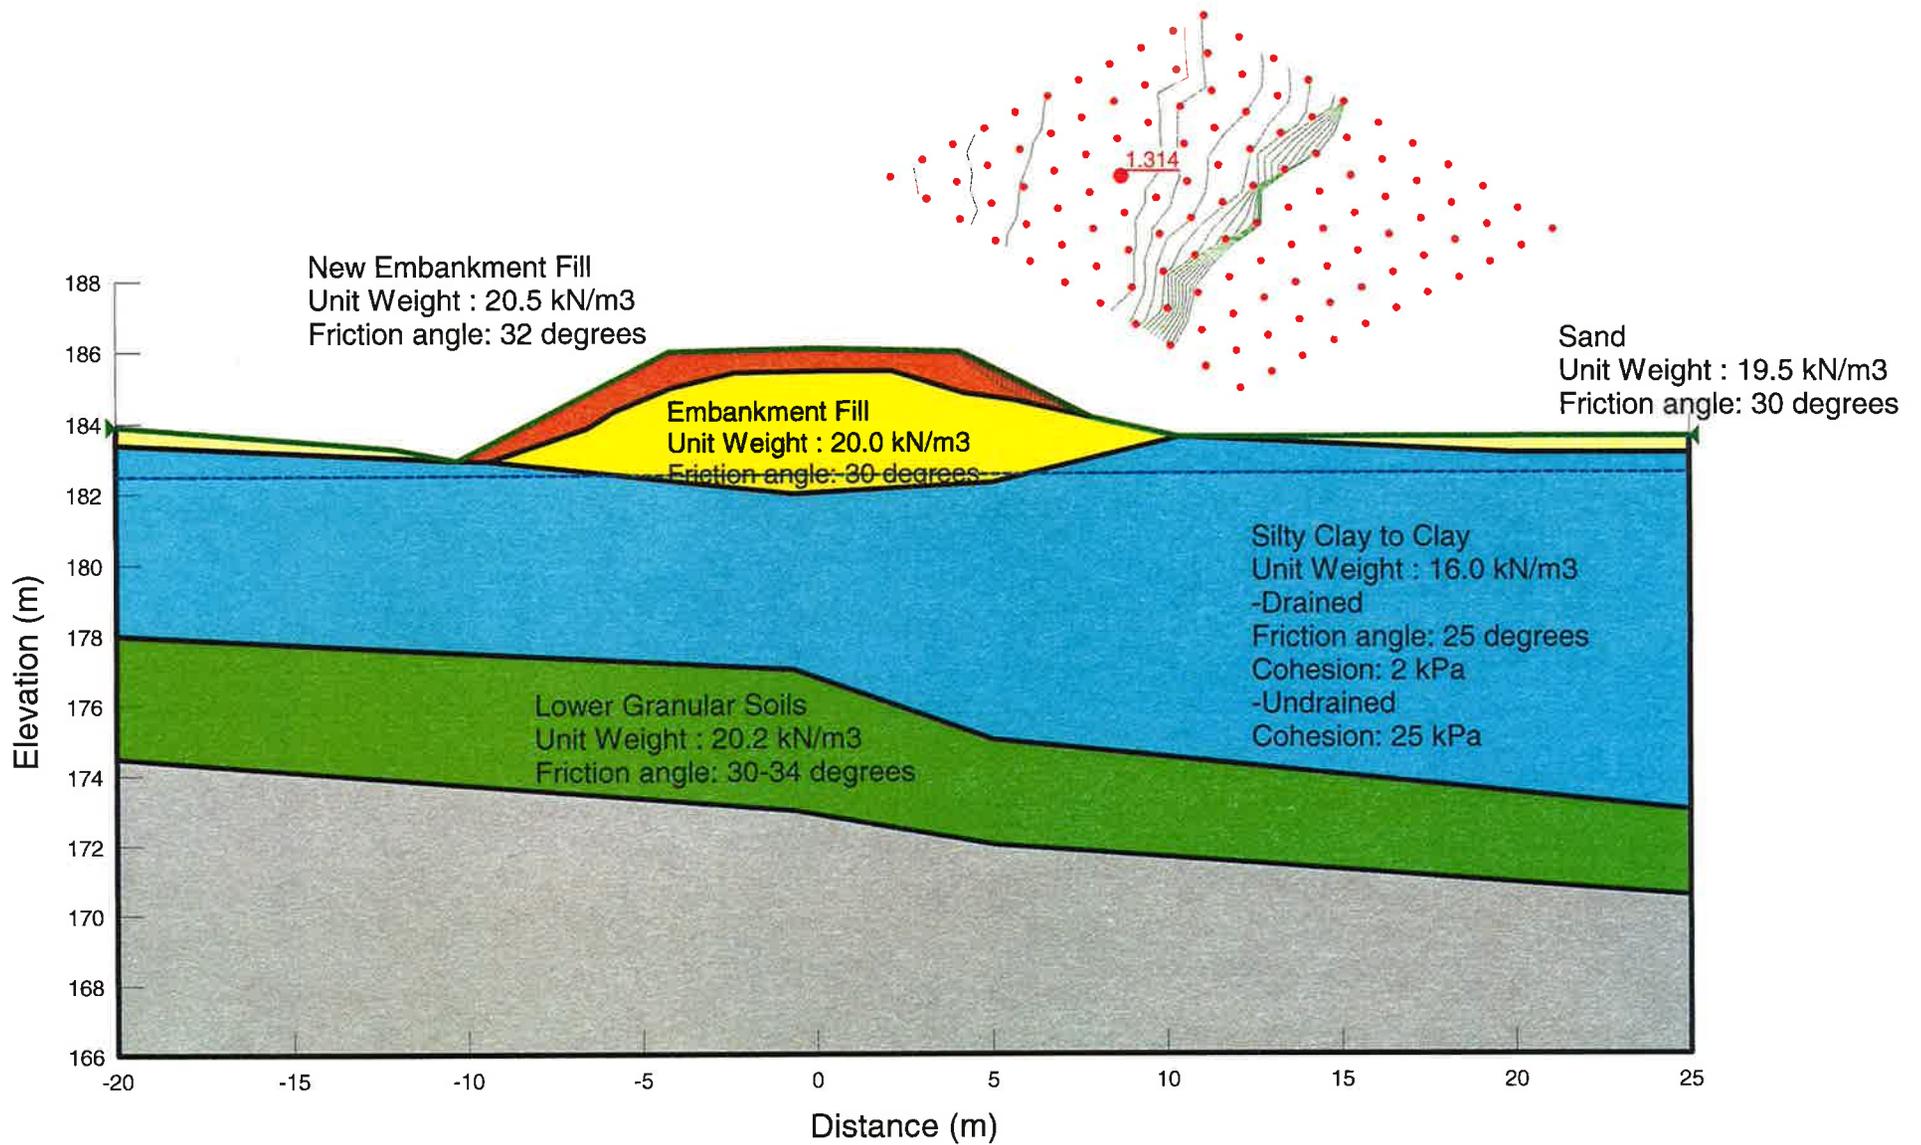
Stability analysis @ STA 10+210 (south abutment location) for concrete bridge option
